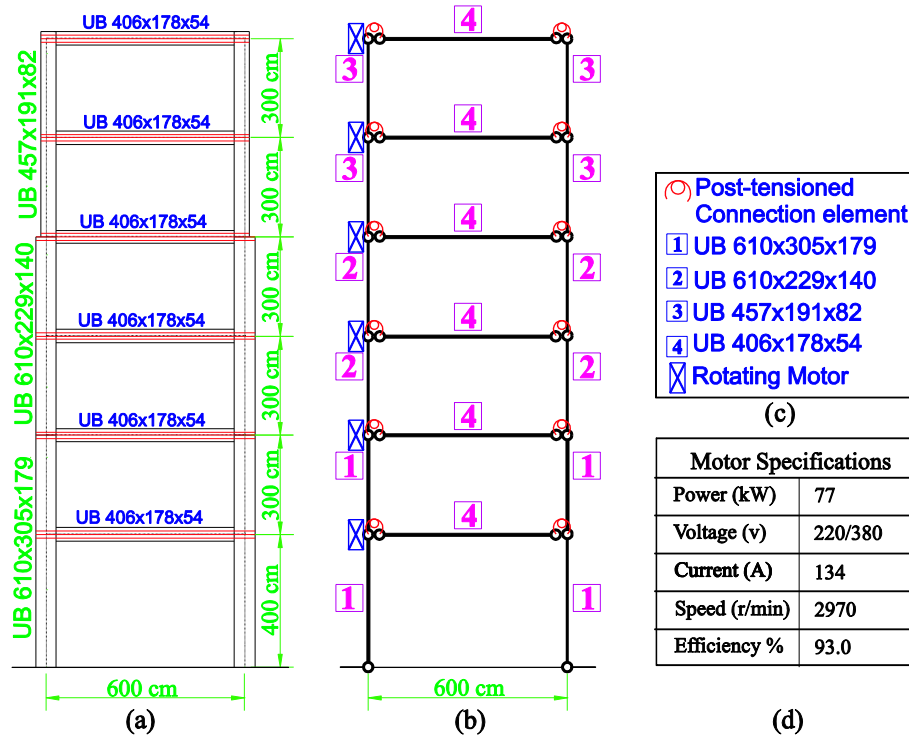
Six-storey post-tensioned steel frame: (a) frame geometry and sections, (b) idealised model of the frame, (c) element and section properties and (d) specifications of rotating motor.
